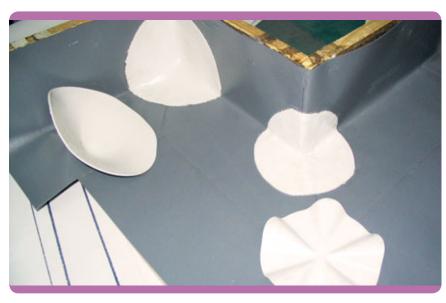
Prefabricated corner pieces for internal and external corners.
